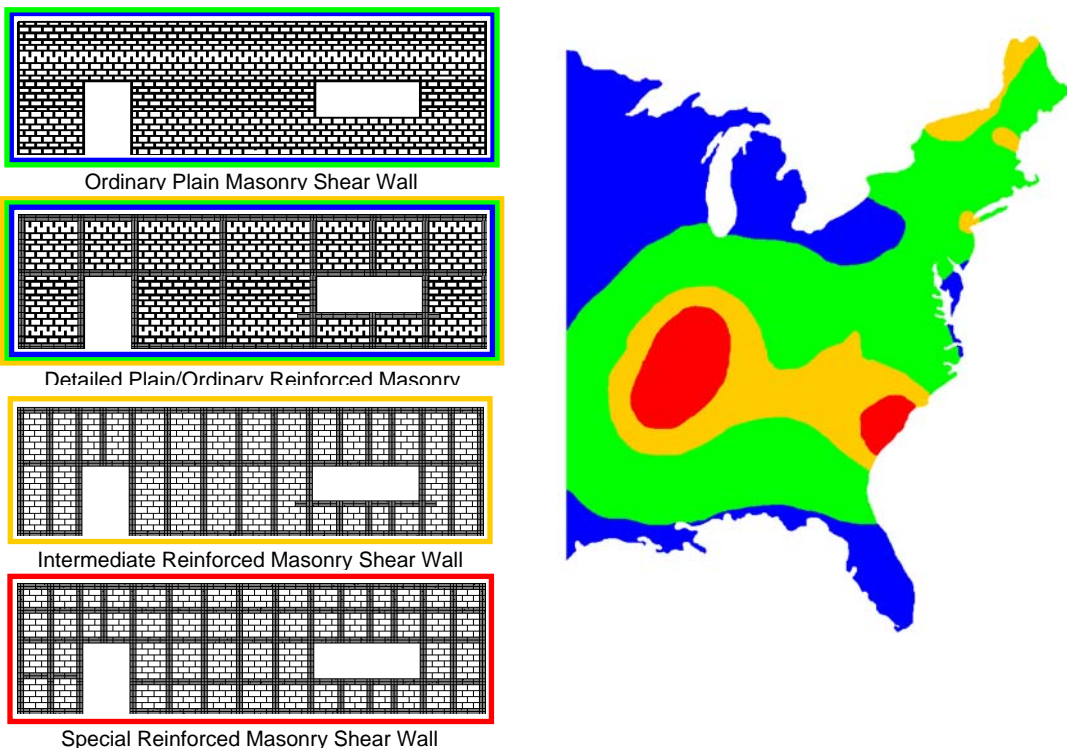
(a) Schematic of the IBC reinforced masonry shear walls and (b) SDC of the Eastern US for soil condition C (IBC 2003 [6])
